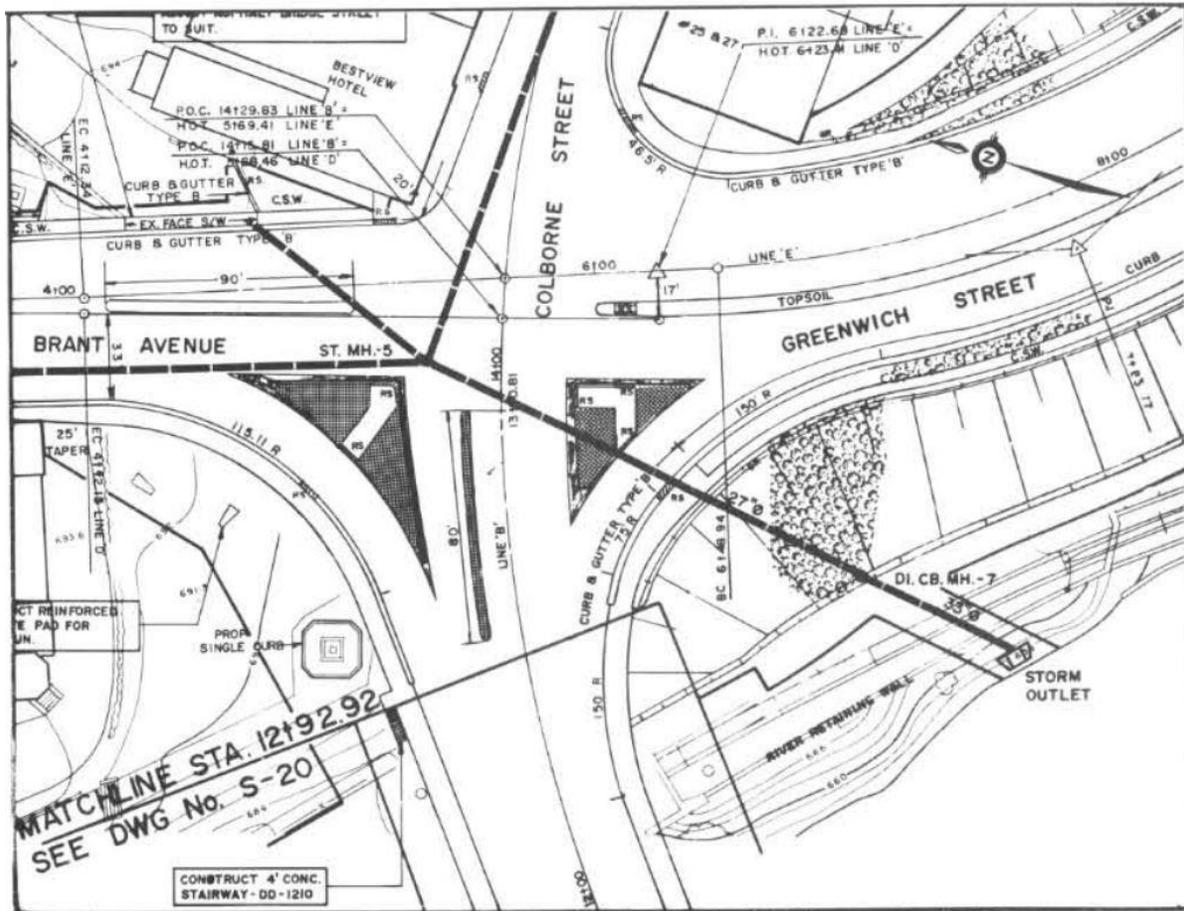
Key Plan, Drawing M-28, Storm Outlet - East Approach, June 5, 1979, By J.D. Lee Engineering Limited
